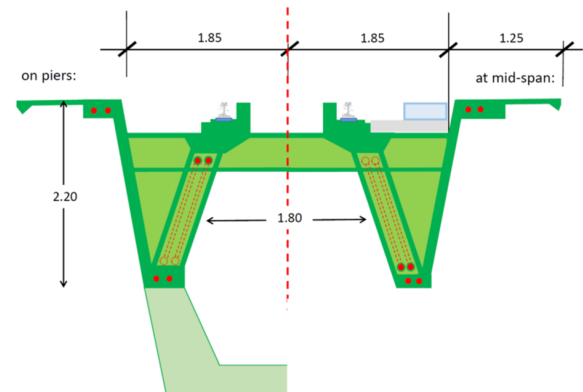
Integrated bridge girder – fixed railway track design in segmental posttensioned R-UHPFRC construction.
